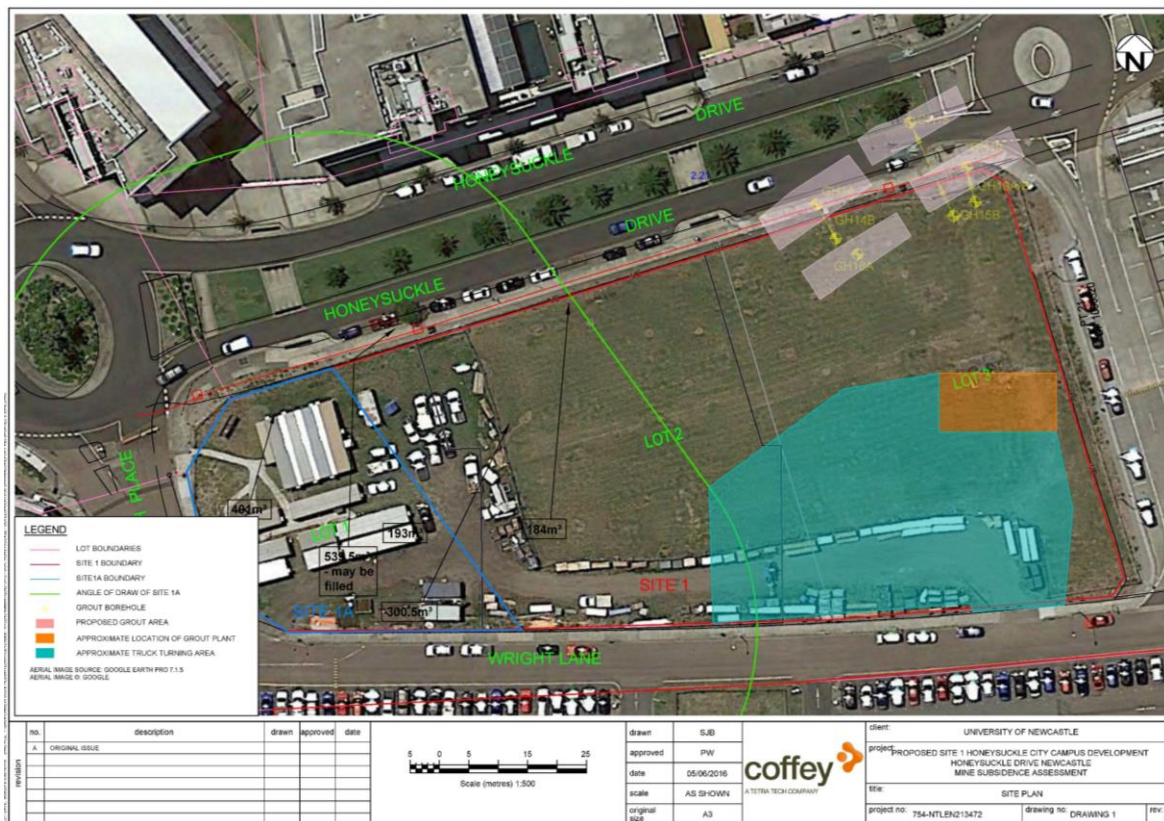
ENABLING WORKS PROPOSED GROUTING WORKS WITHIN AREA 1 (SOURCE: COFFEY 2018)
